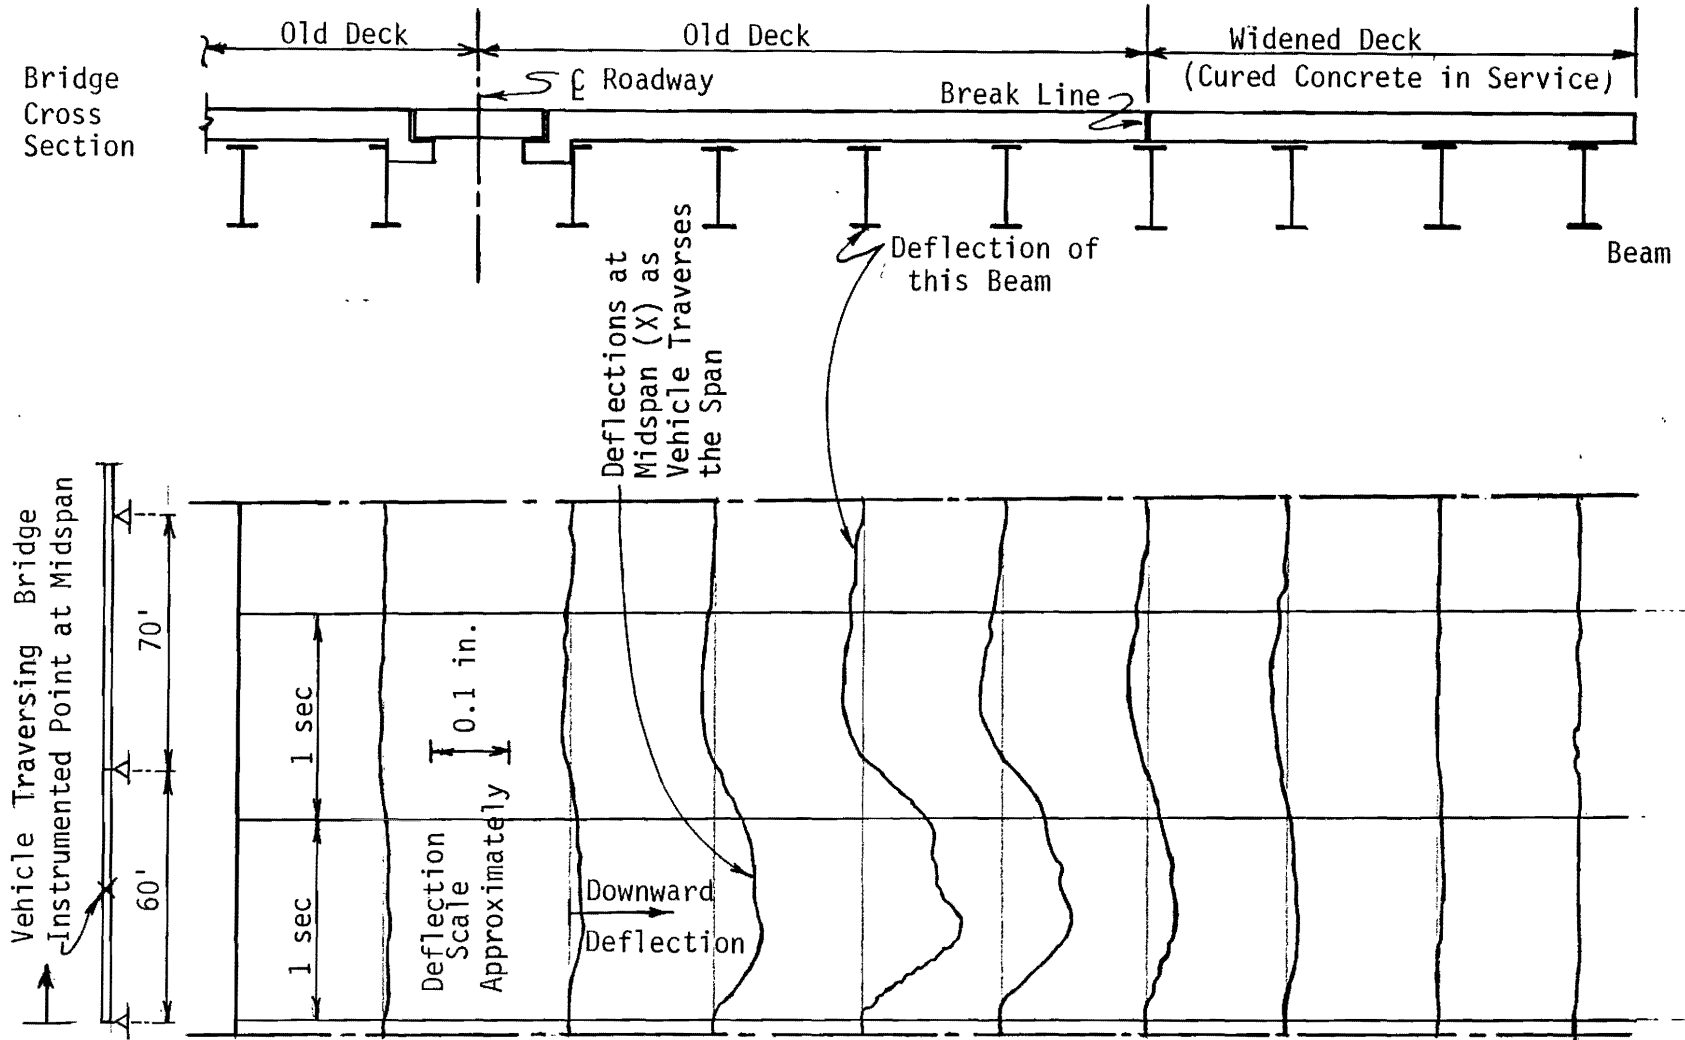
a. I-35 and Avenue D, Temple, Midspan Deflections of Beams due to One Crossing
